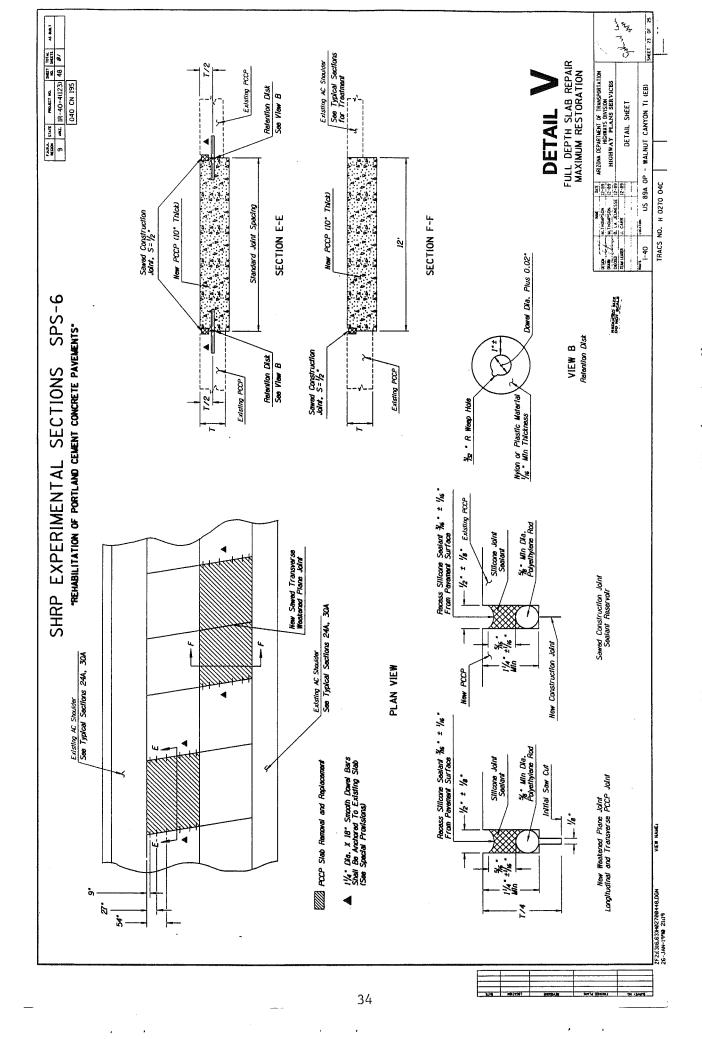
PAVEMENT RESTORATION DETAILS (continued)
